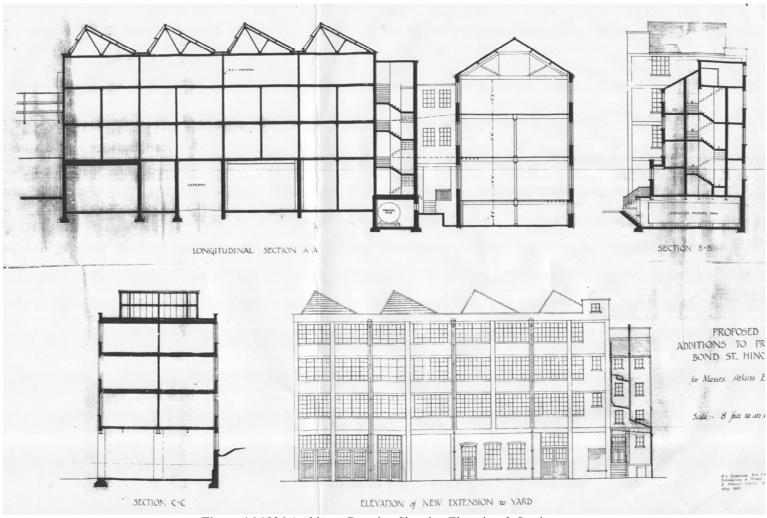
1926 Architects Drawing Showing Elevation & Sections.
